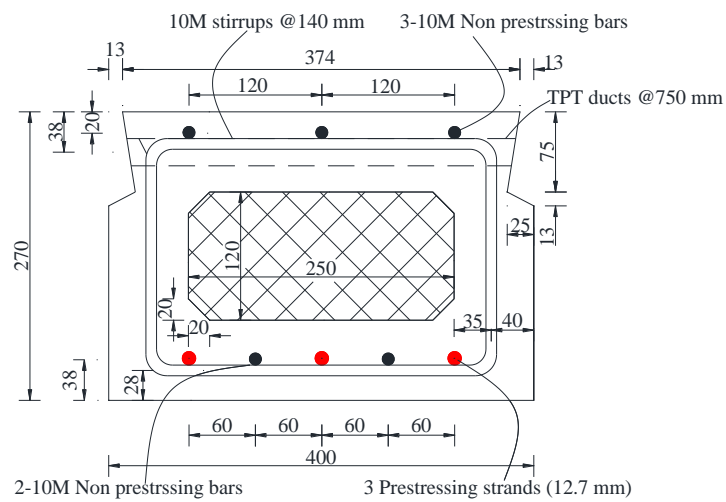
Reinforcement details of an interior girder (dimensions in mm)
